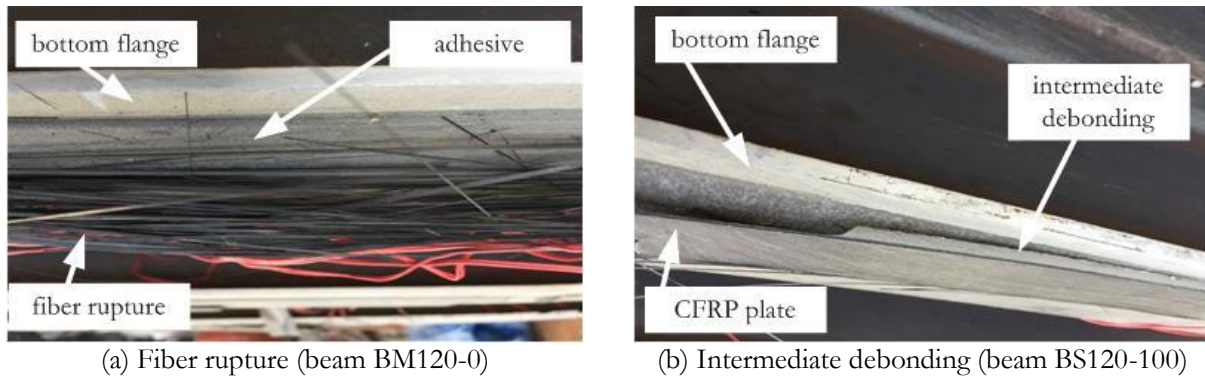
Close-up view of failure modes of CFRP-strengthened steel beams.
